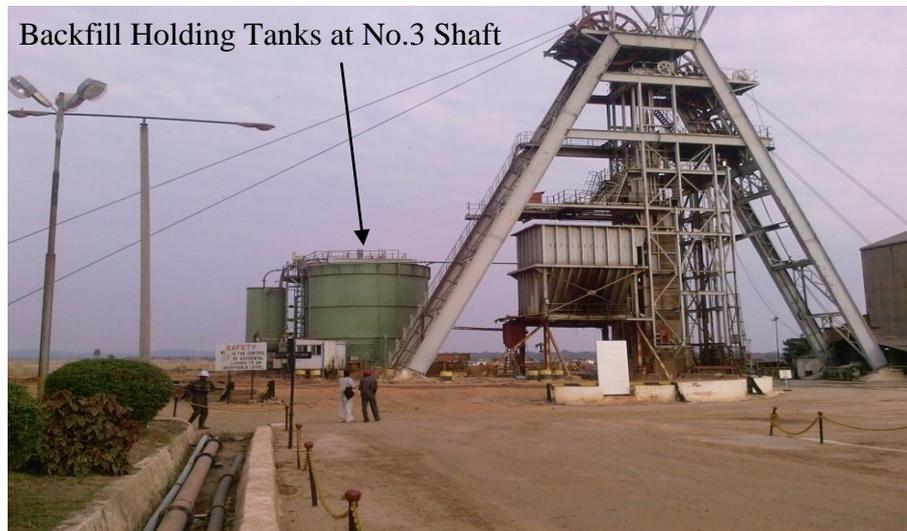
Pipe delivering Hydraulic Fill material to No.3 Shaft underground Mine
